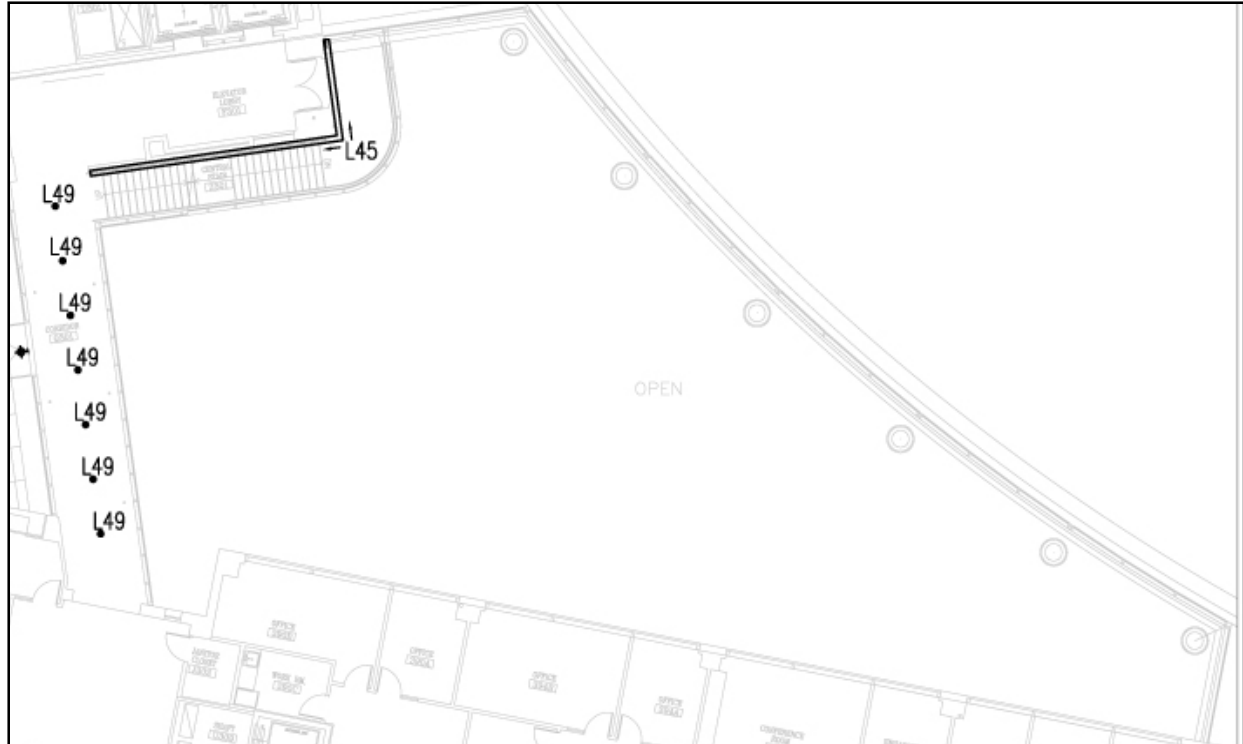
Atrium Lighting Plan, Second and Third Floors
